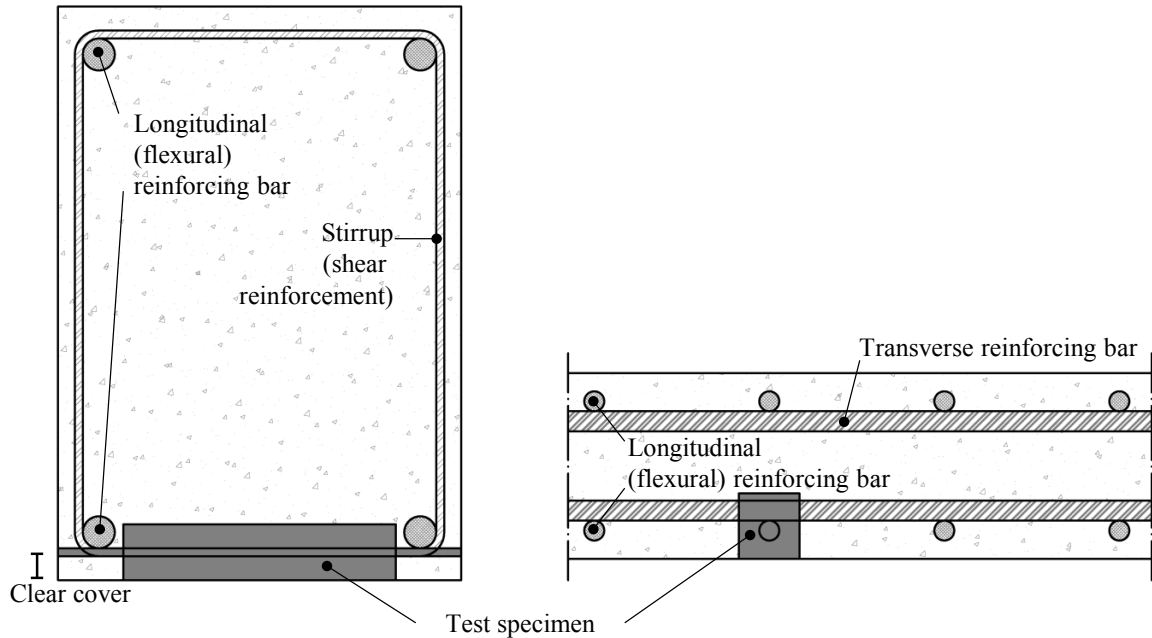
Concept design of small-scale RC specimen (shaded area)
